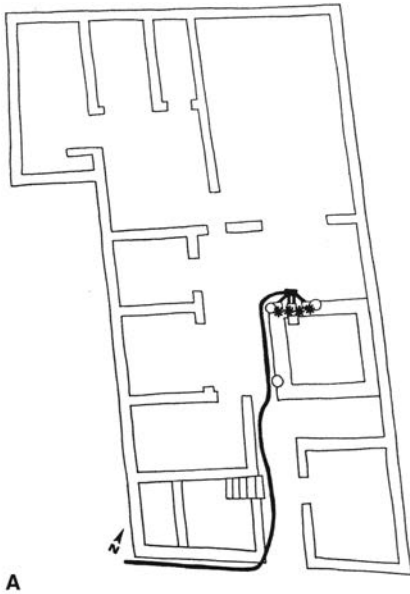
A House of the Balcony, VII.12.28, Pompeii, plan with pipes and fountains indicated.
